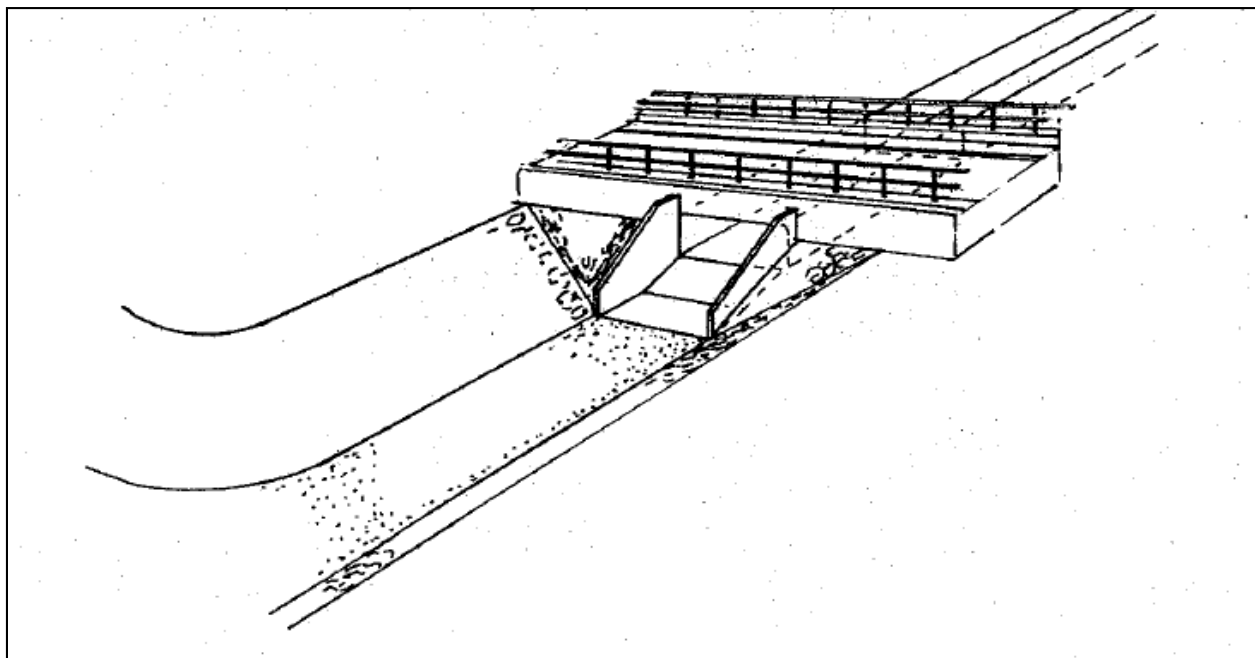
The previous outlet configuration (constructed in Spring 1969) at the downstream end of the Arundell
